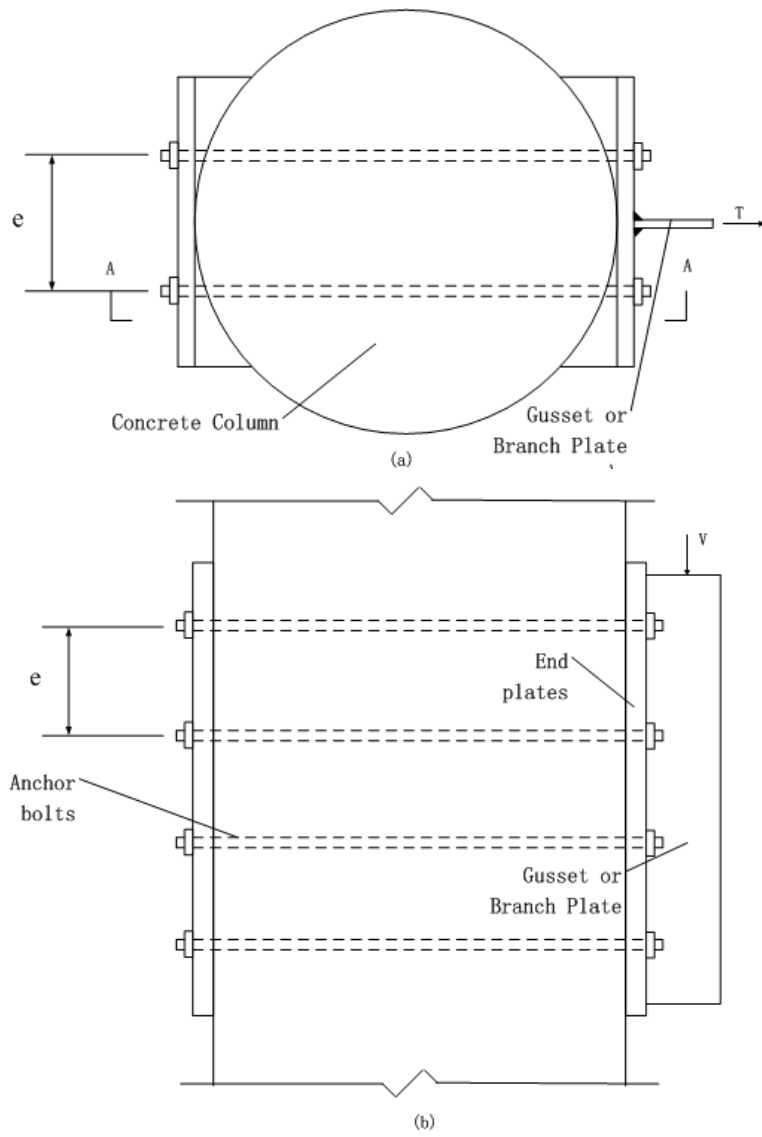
(a) Connections of steel plates with circular concrete columns using anchor bolts (b) Section view of A-A
